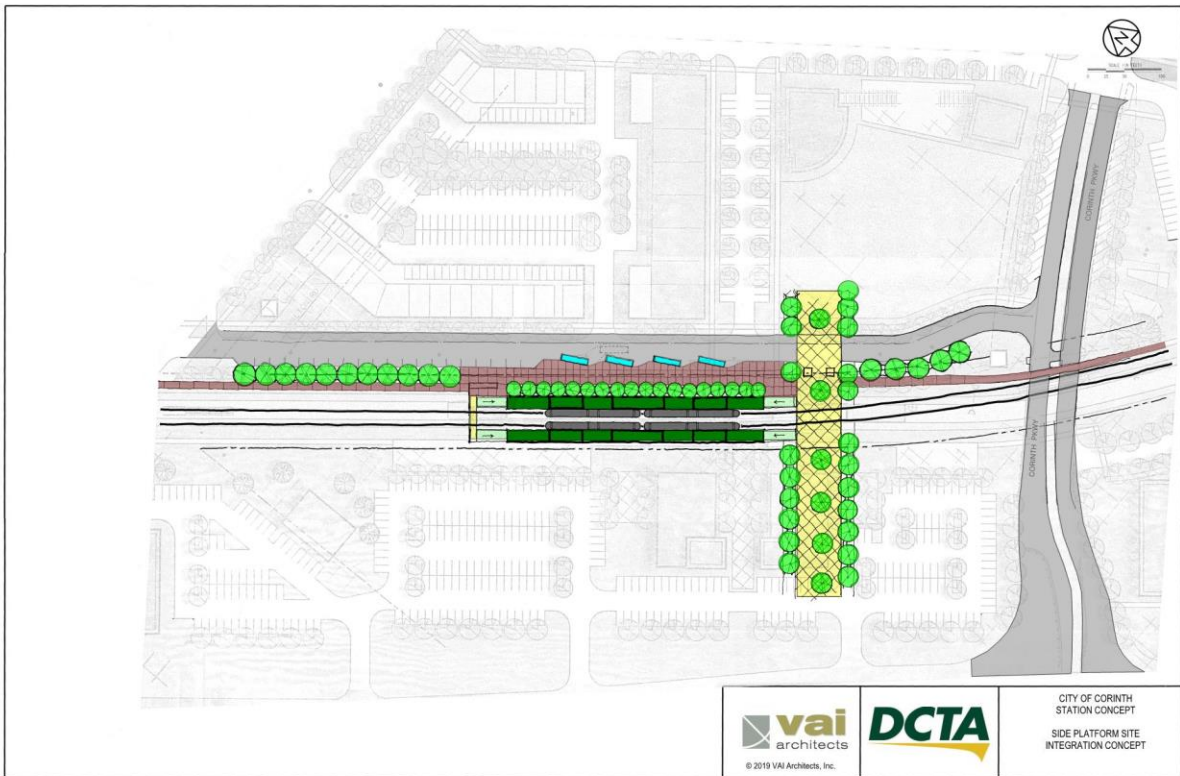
Corinth Station Concept 1-C Side Platforms Access Details
